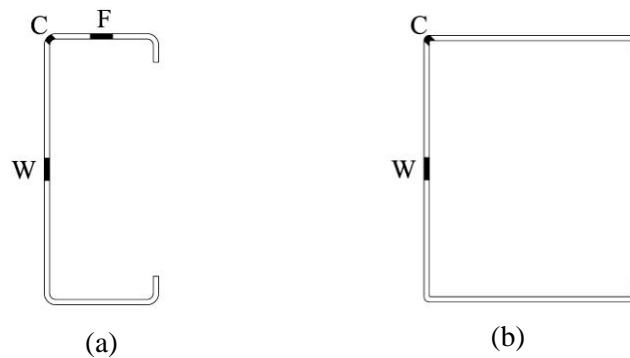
Location of coupons taken from the (a) roll-formed section, (b) brake-pressed section
